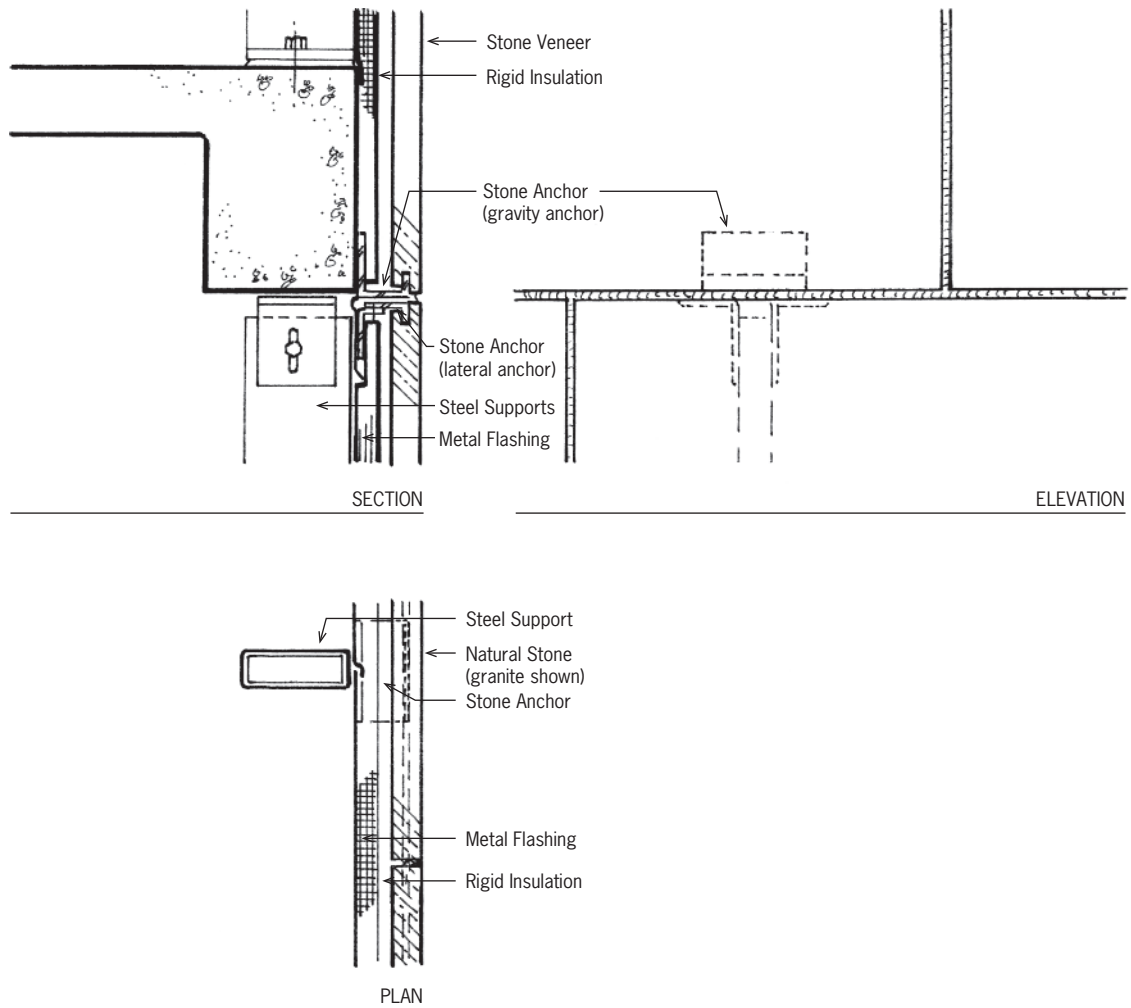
Framed masonry natural stone wall systems rely on the primary building structure and the steel supports illustrated for gravity and lateral support. The stone itself accommodates and transfers lateral loads to the stone anchors, and the stone anchors support the stone self/dead and lateral loads. The stone cladding itself accommodates and transfers loads for the enclosure system structural integrity.
